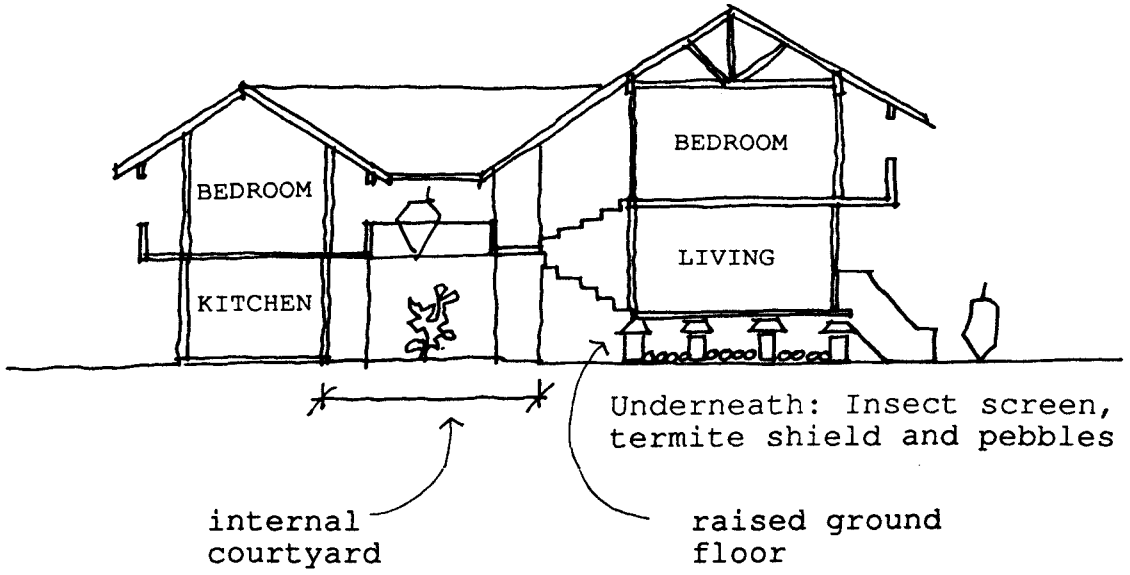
Section showing a partially raised terraced house with the incorporation of a courtyard at the rear to improve lighting and natural ventilation.
